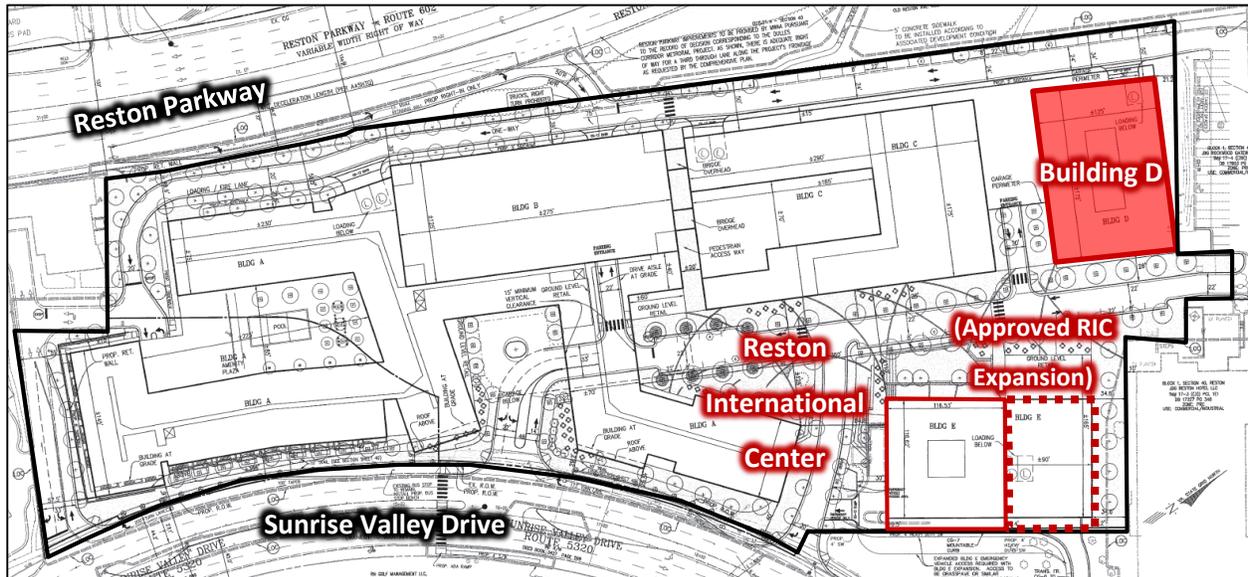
Building D as shown on the approved PRCA Plan. The applicant has requested 700 square feet of sign area for this building, but has not depicted sign locations or sizes for this building’s signs in the CSP. (Source: Urban, Ltd., March 15, 2013)
